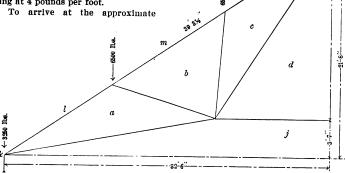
Truss Diagram .- Scale, 1/2 Inch to the Foot.
